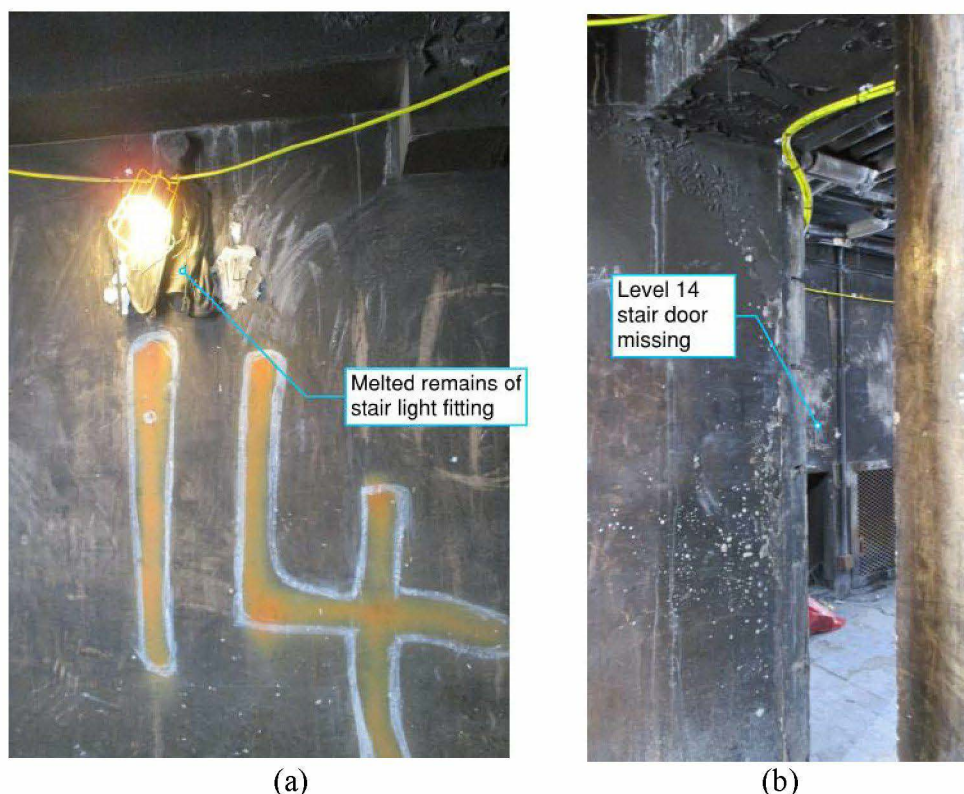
(a) Stair light fitting condition and (b) door condition on Level 14
